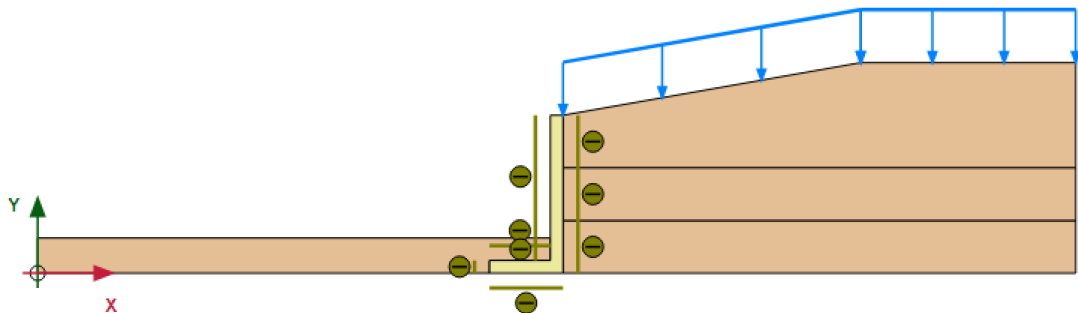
Retaining wall with backfill slope 10° and no TDA backfill
